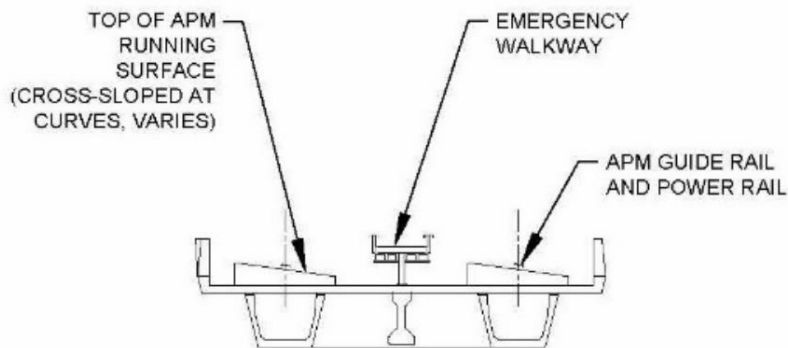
Existing Skylink Guideway Cross-Section at Curves (Typical)
